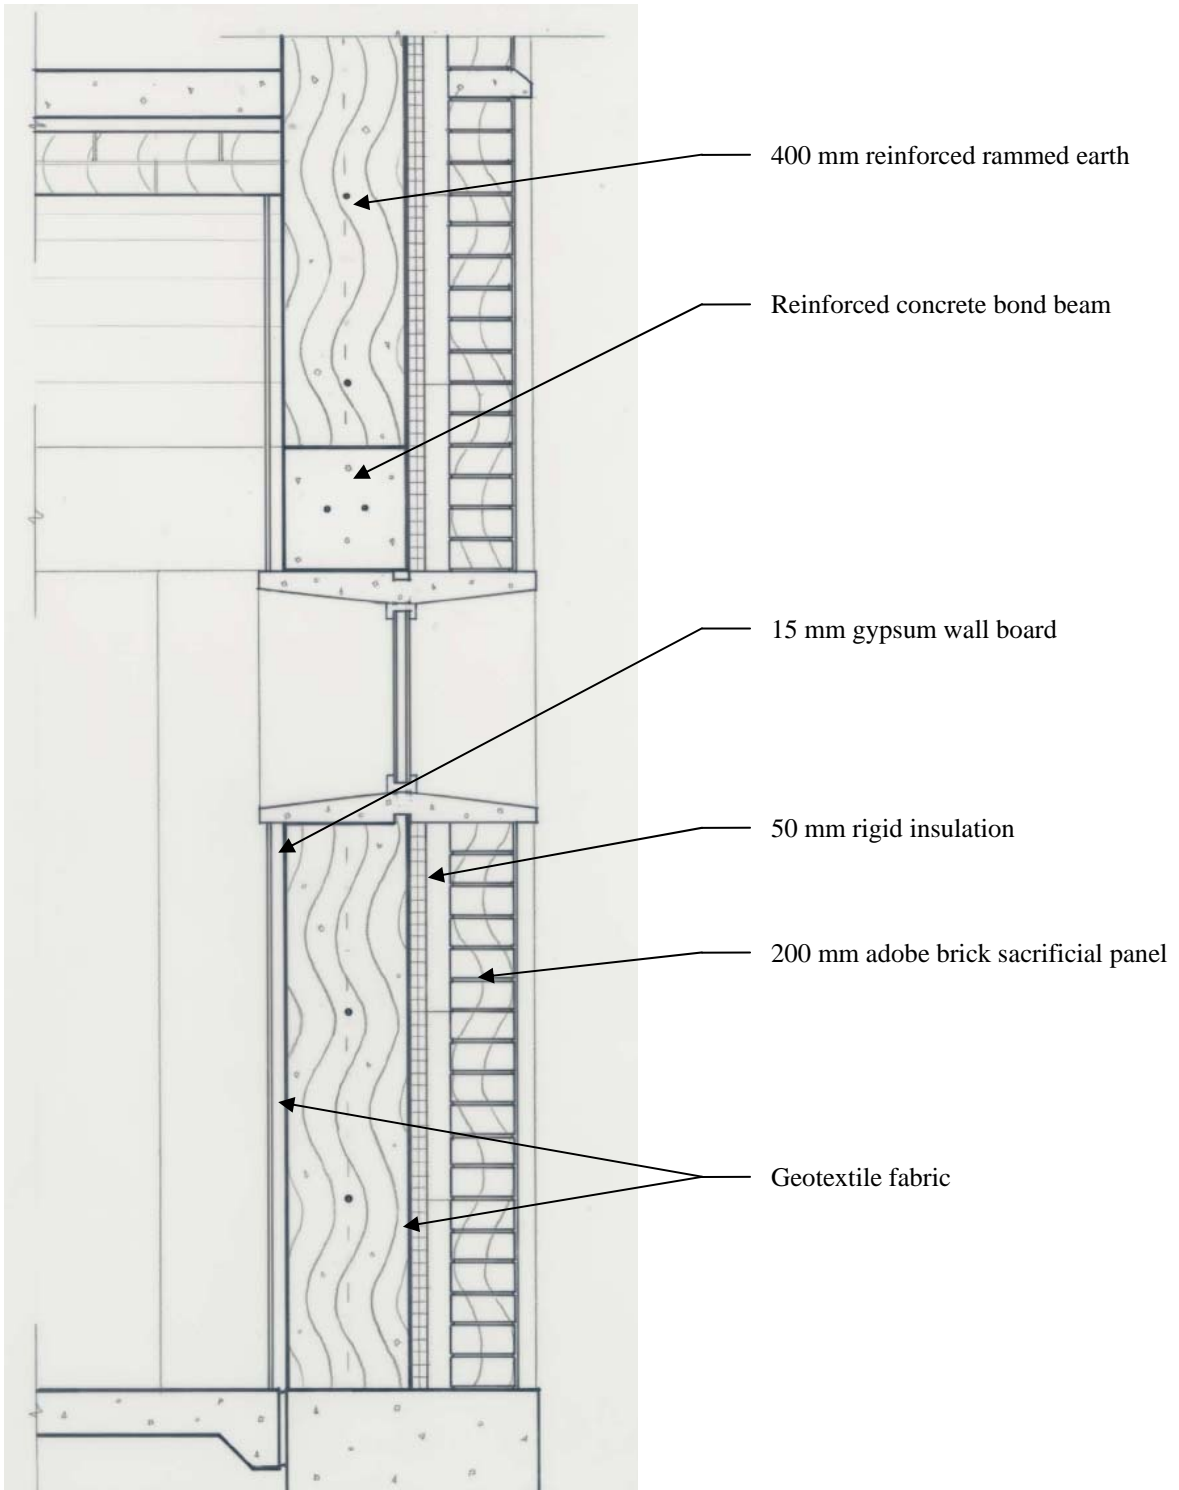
Monolithic Earth Wall Section. The earth wall section has a deep profile and results in a permanent structure.
